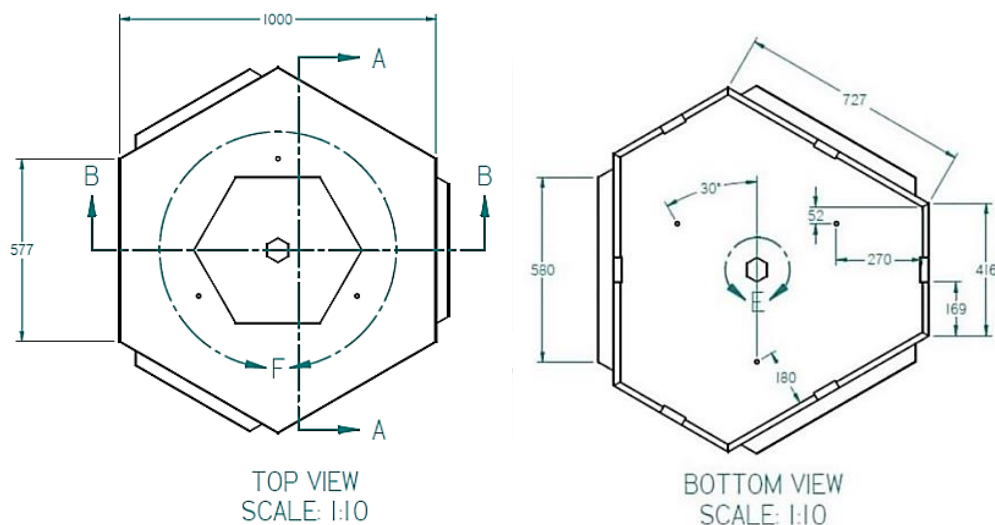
Top and bottom view of the concrete pavers (Omidi 2021)
